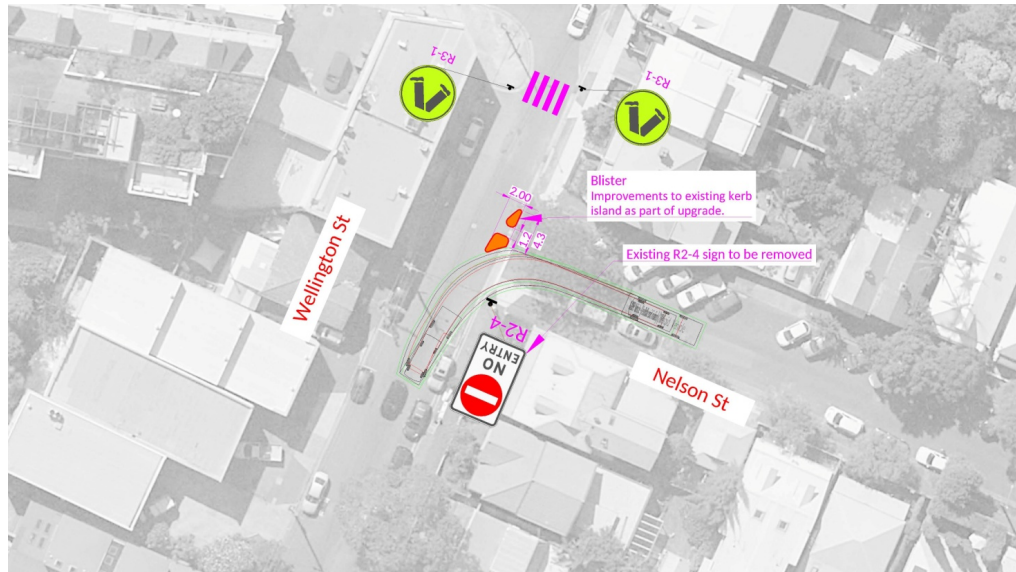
Nelson Street / Wellington Street intersection proposal
